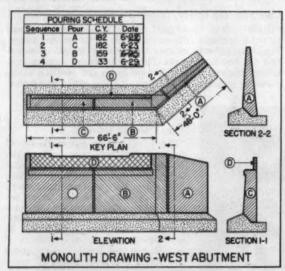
POURING SCHEDULE planned in advance—and forms designed accordingly—for construction of a bridge pier monolith. In addition to saving time and materials through form reuse, contractor got best use out of other equipment.
